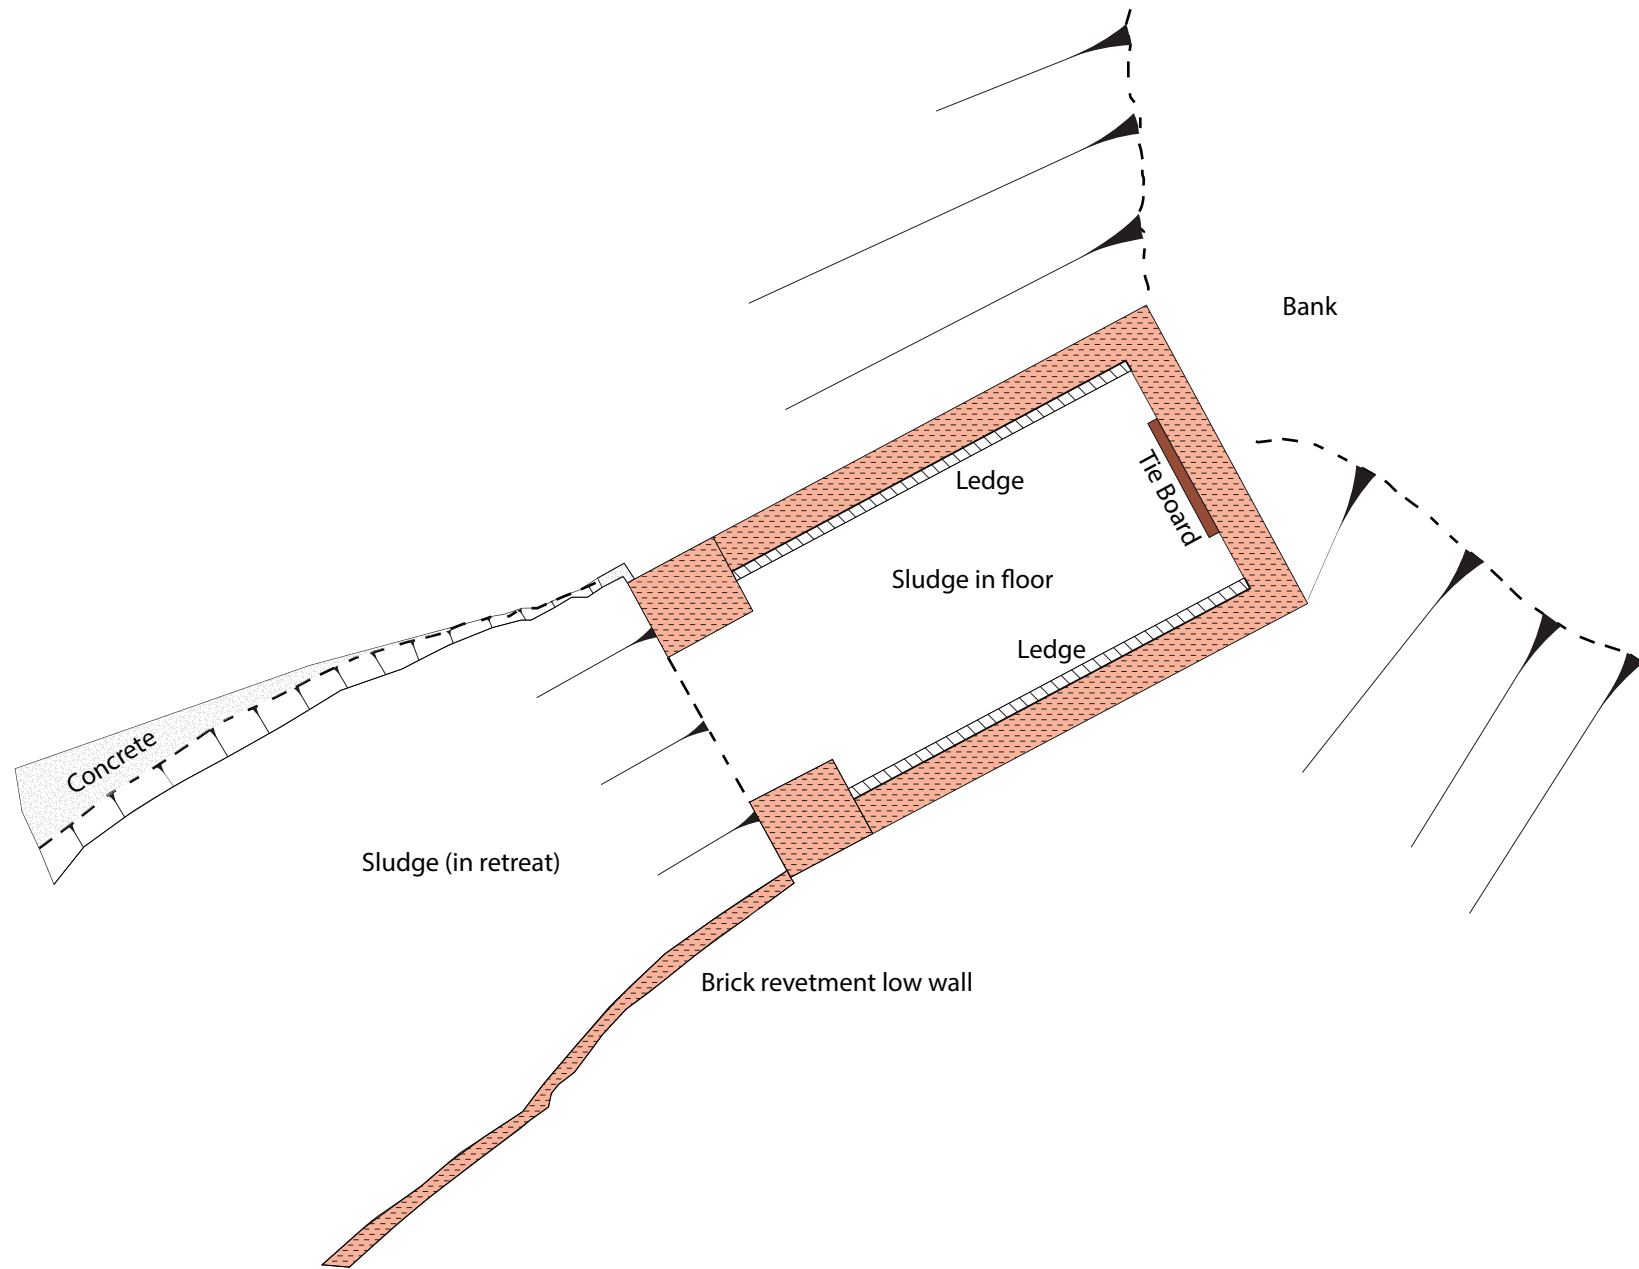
Plan of Boat House at Llyn Bran Reservoir. Scale 1:50 @ A4
